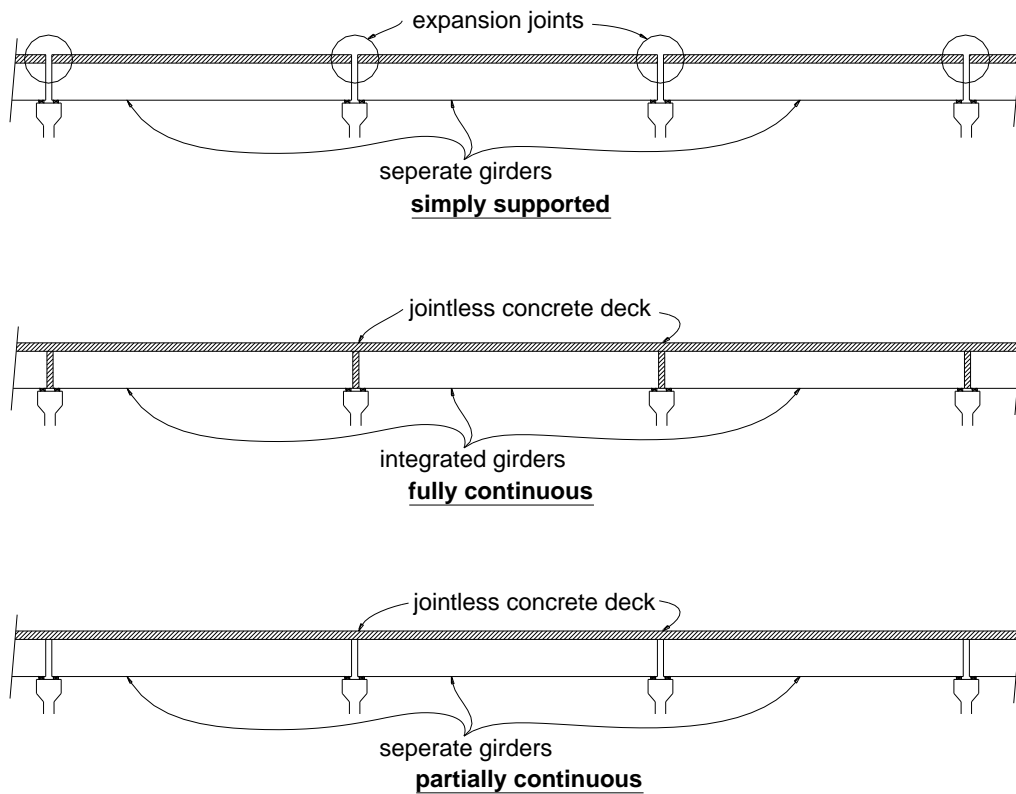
Typical continuity conditions in precast PSC girder bridges (Okeil and El-Safty 2005)
